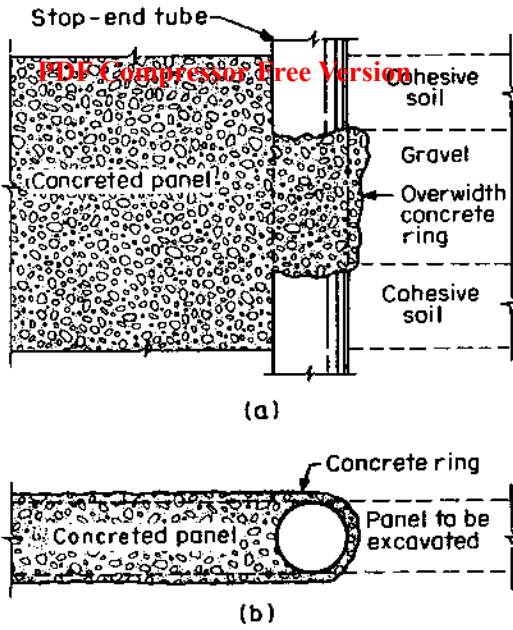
Penetration of concrete beyond the stop-end tube due to overbreak a) partial elevation; b) partial section (Xanthakos 1979).
